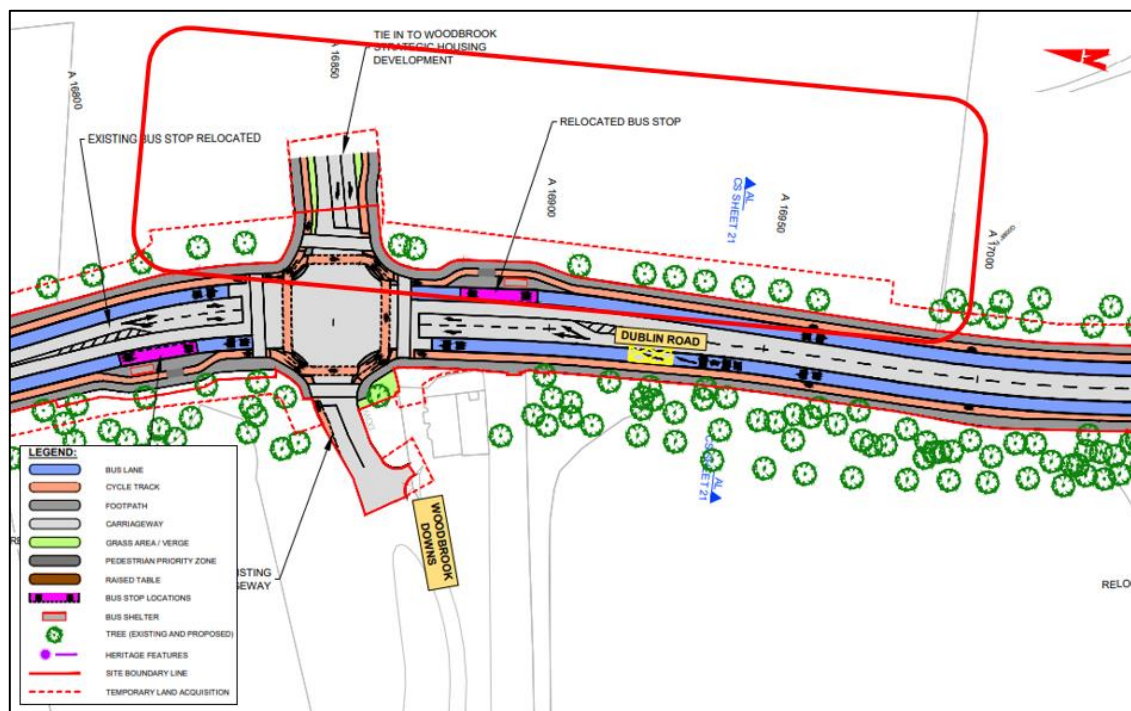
Extract from General Arrangement Drawings at Dublin Road (Sheet 48)
